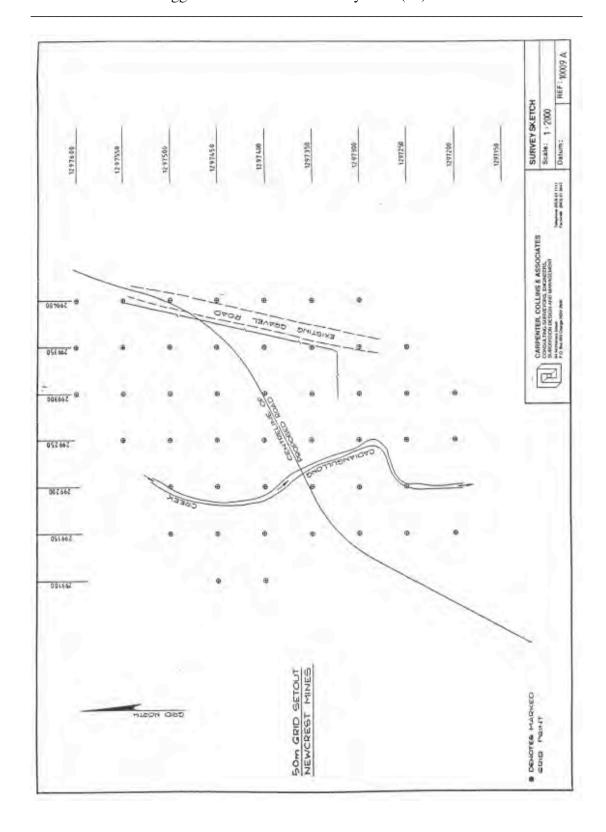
Plan showing the line of the proposed Mine Access Road in relation to the Cadia Mine Survey Grid.
